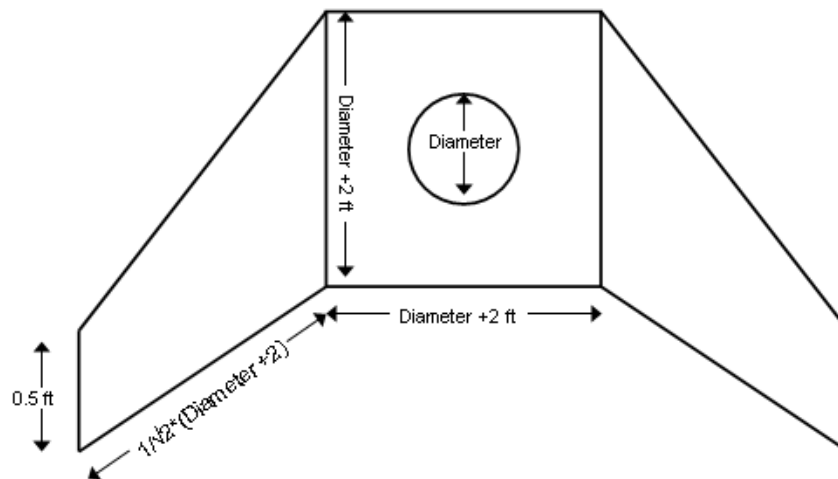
Sand filter outlet headwall with 45 degree wingwalls
